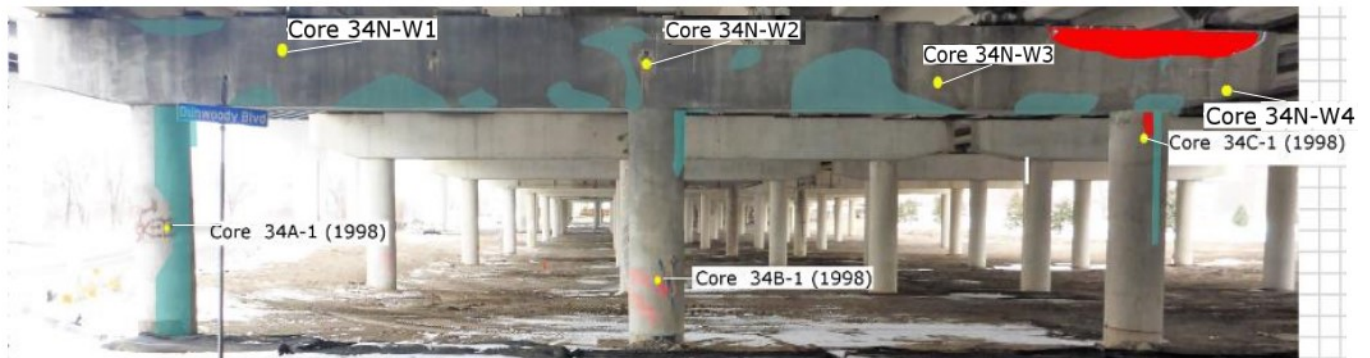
Pier 34WB [ECE] - West face - Delaminations in 2018 (red) and 1998 repair areas (blue)
